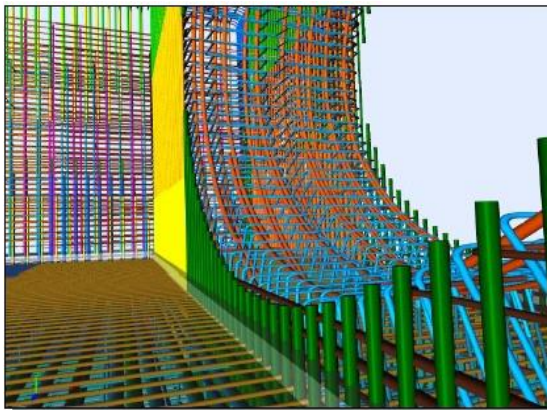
Detailed, integrated reinforcement steel design with 3D models
